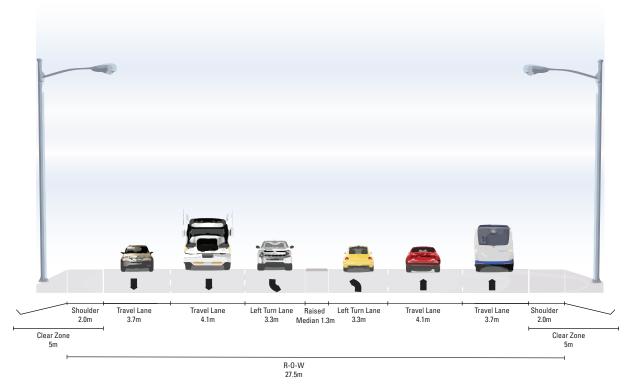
Highway 10 Typical Section, Open Shoulder
